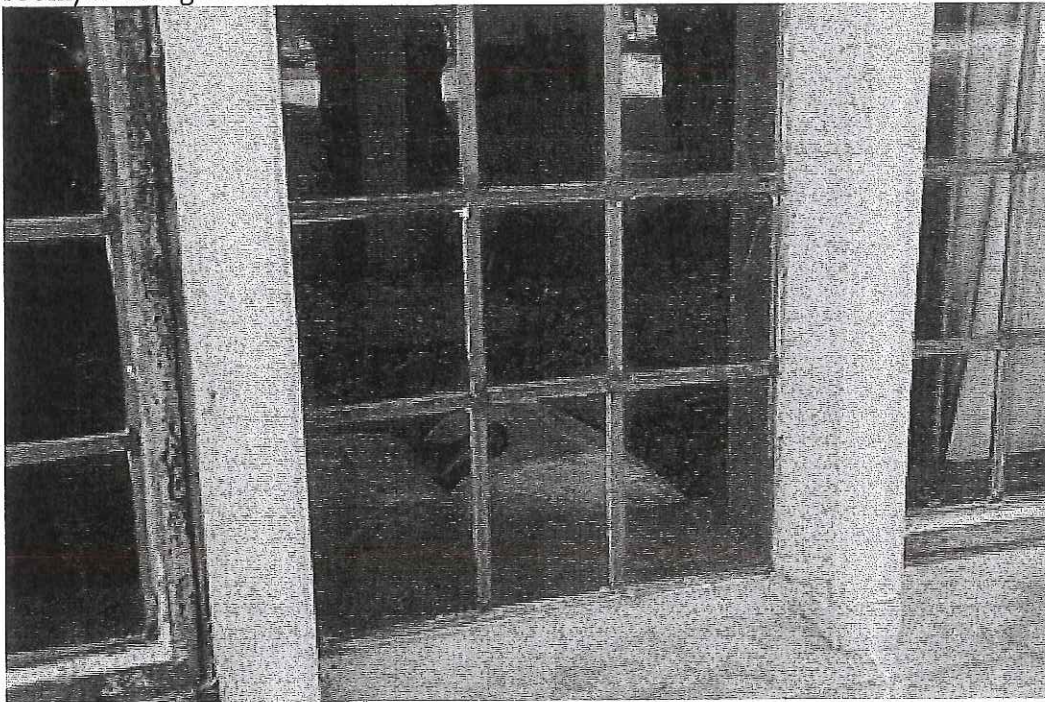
East side entrance from parking lot; simpler in detail than North entrance
